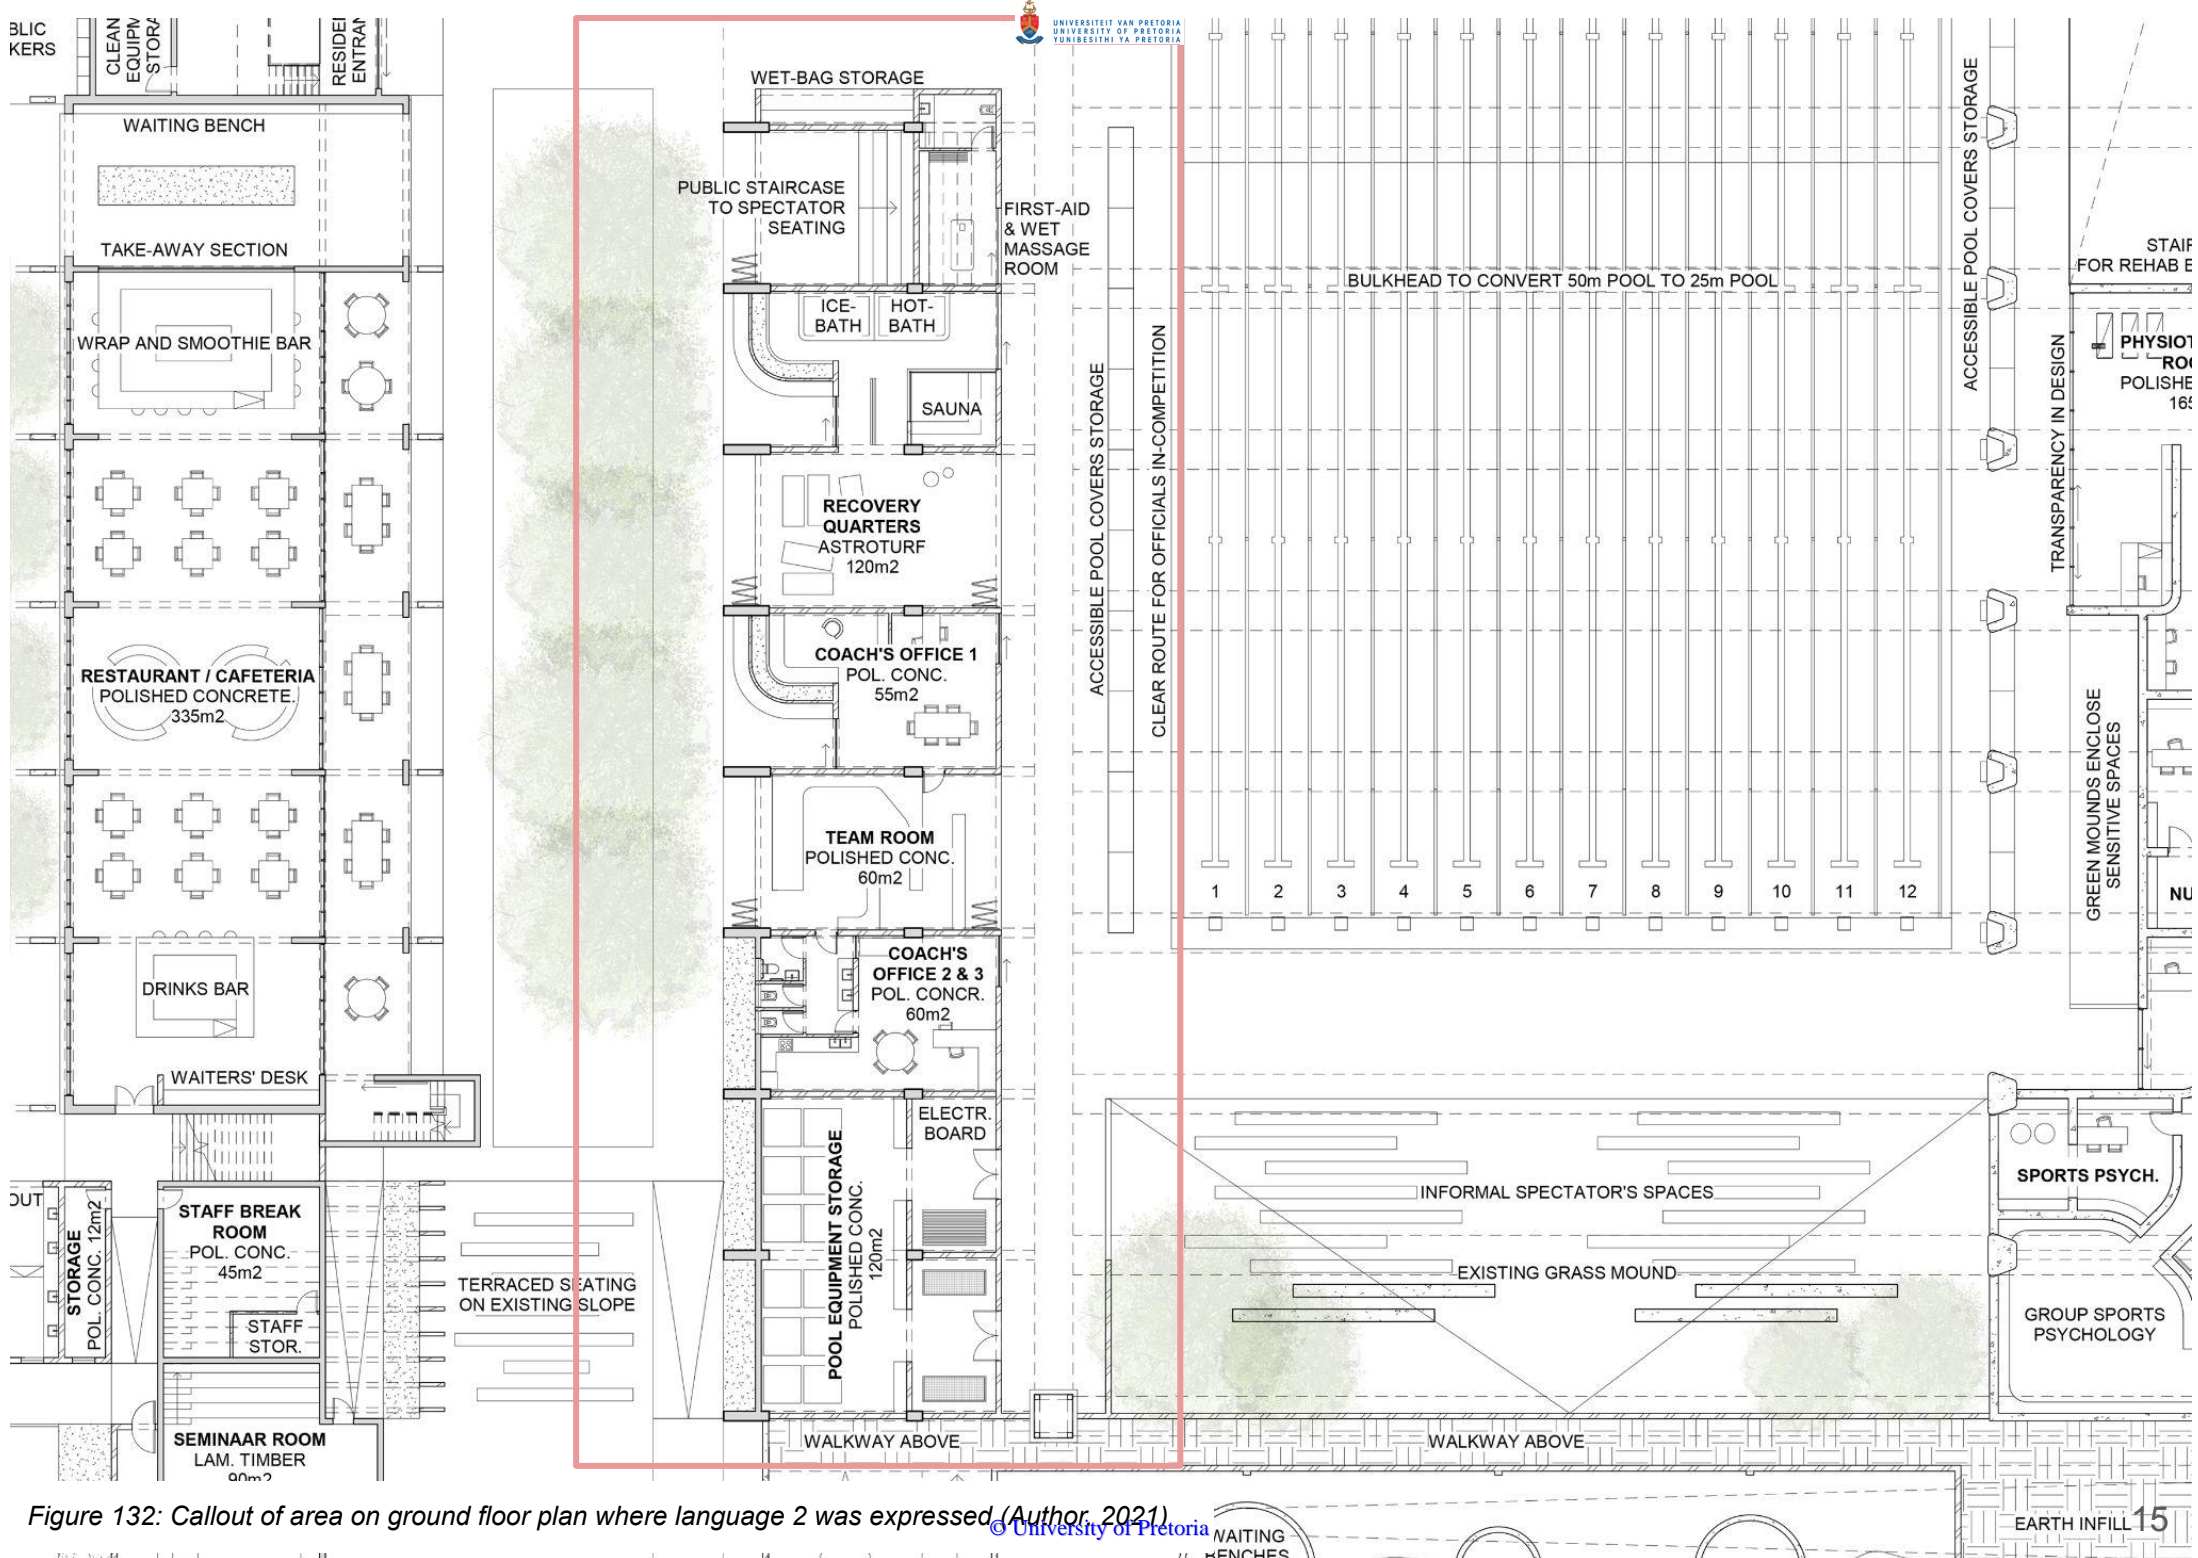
Callout of area on ground floor plan where language 2 was expressed (Author, 2021)
